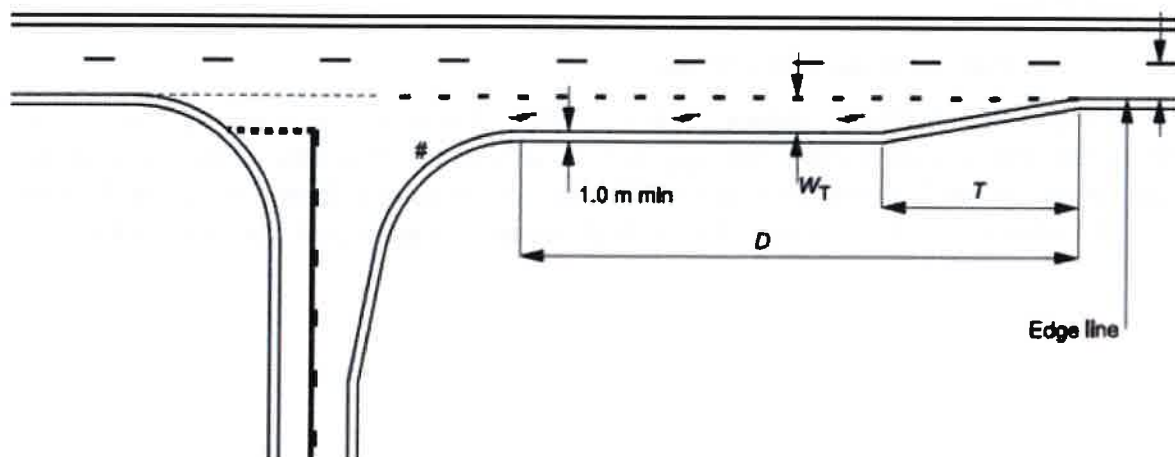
Rural Auxiliary Left Turn Treatment (AUL) (DTMR *Road Planning and Design Manual Chapter 13: Intersections*) at Grade)
